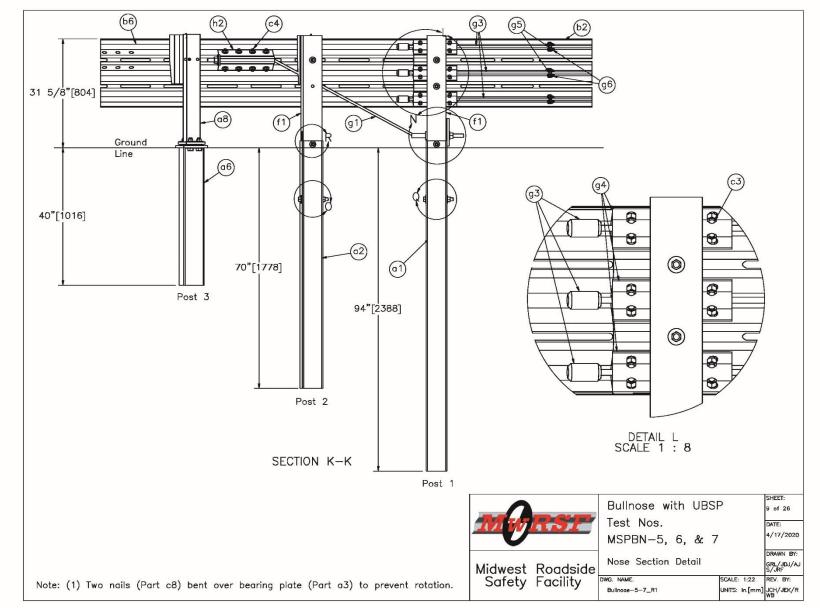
Nose Section Detail, Test Nos. MSPBN-5 through MSPBN-7
